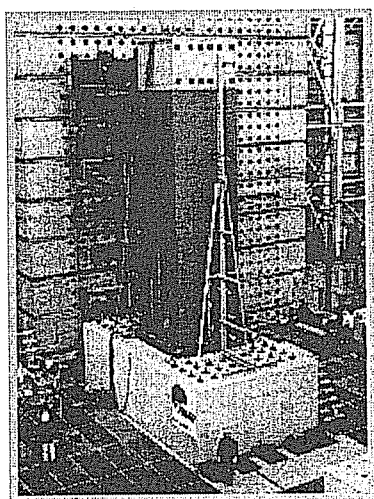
Cyclic Loading Test using a Real Scale Specimen
